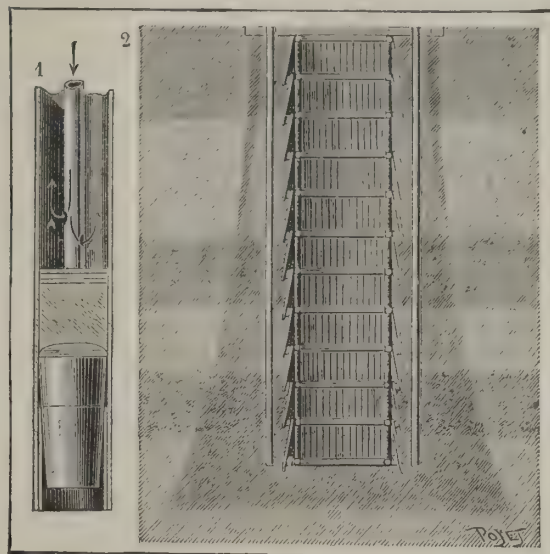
THE PÖTSCH METHOD OF SINKING SHAFTS.
